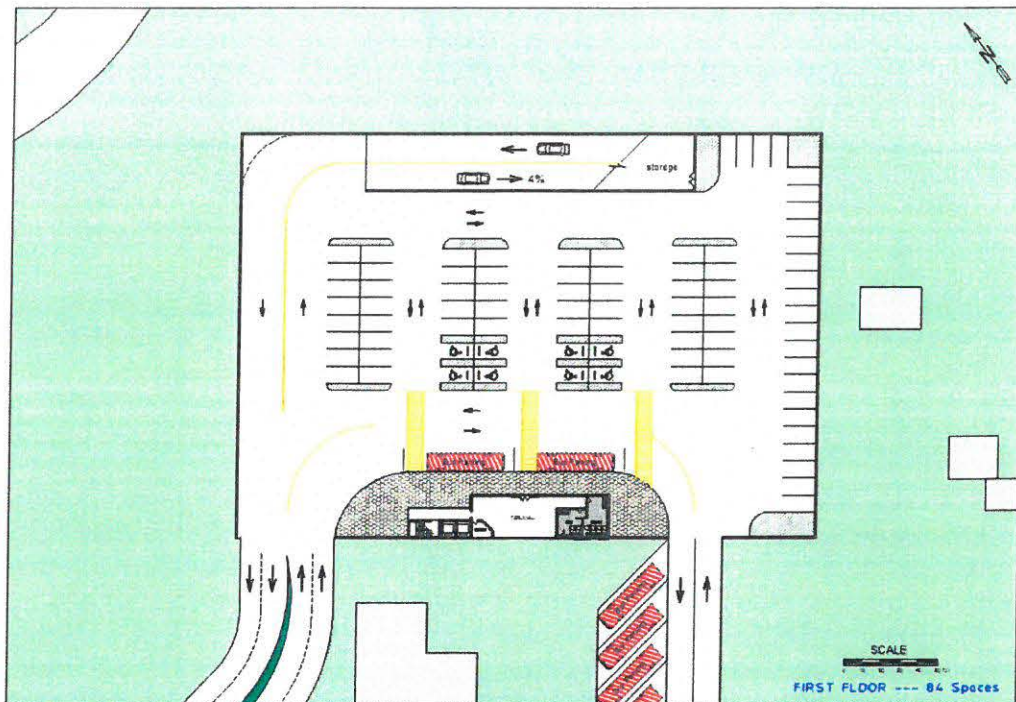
Figure X: Fredericksburg Potential Parking Center and Transportation Terminal Site Plan:
